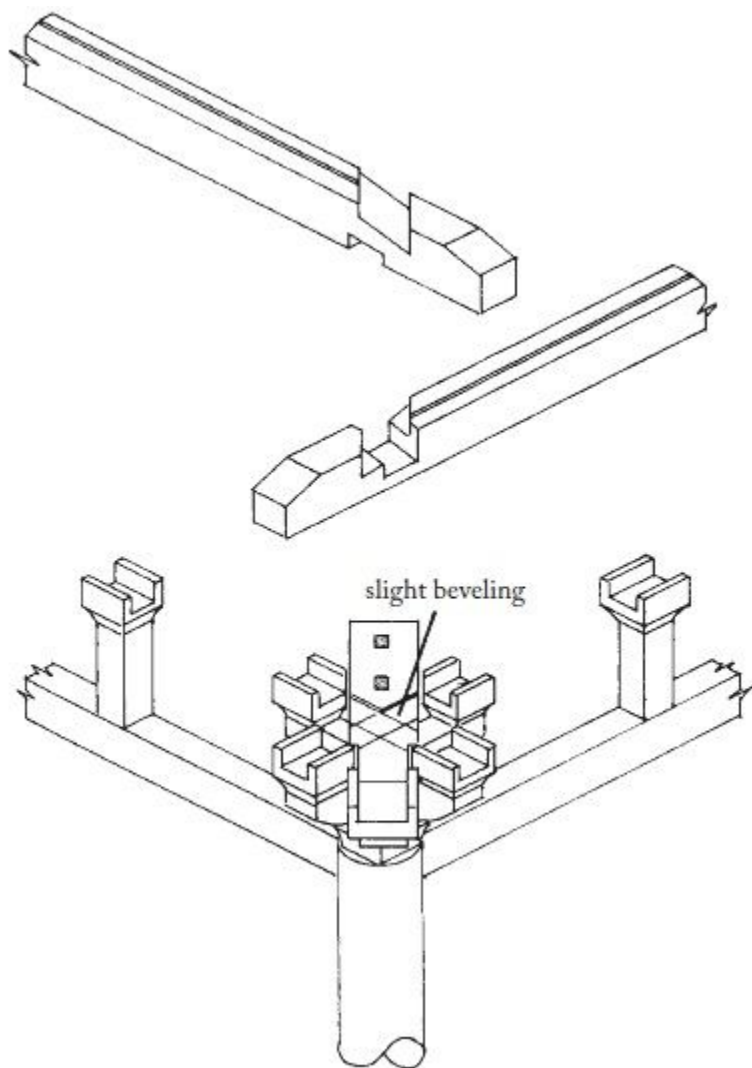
Wall purlins are joined at the corners with a simple cross-lap joint so as to accommodate the slope of the purlins as well as that of the members to be installed above.
